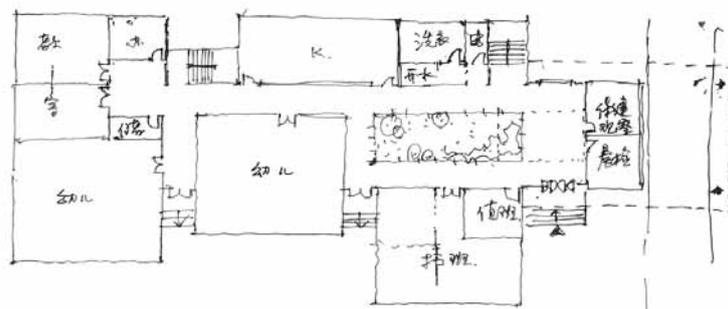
Kindergarten in Suzhou, China, sketch of the ground floor (drawing by Richard Cai, AAI, Shanghai, 2010)
